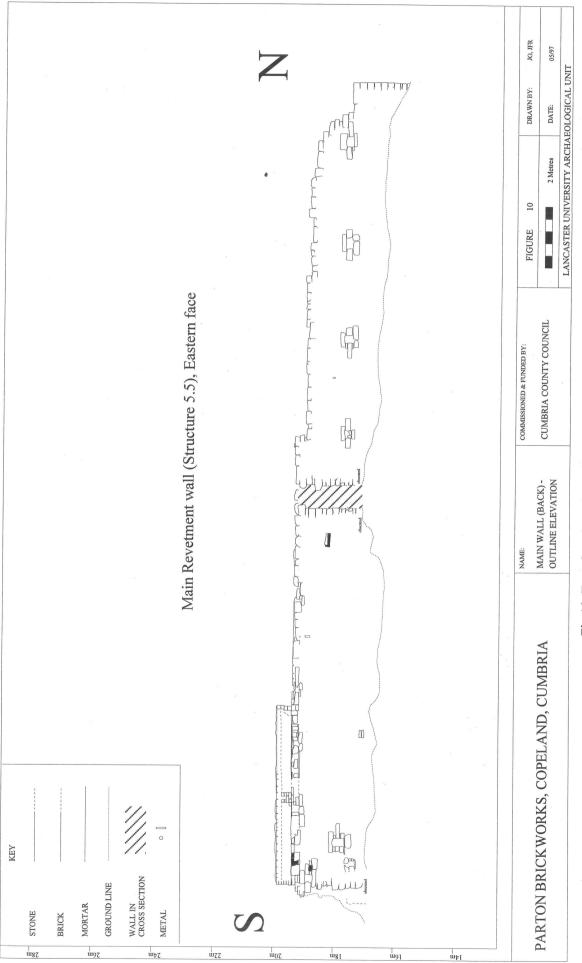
East elevation of the main terrace wall (Structure 5.5)
